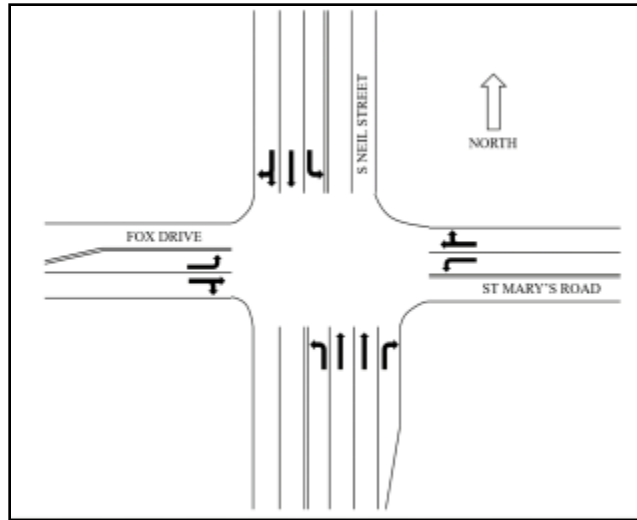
Geometry of the intersection of Neil Street and St. Mary's Road.
